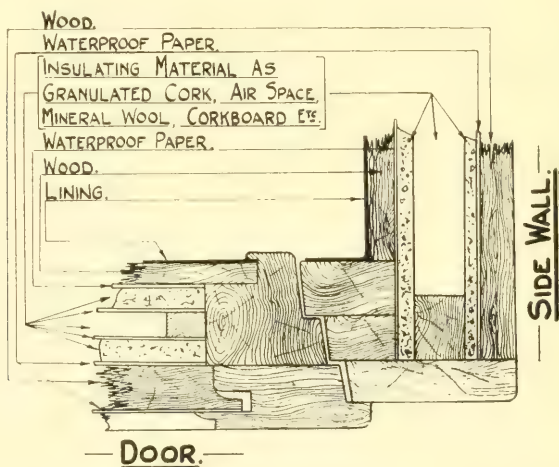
TYPICAL REFRIGERATOR WALL AND DOOR CONSTRUCTION
